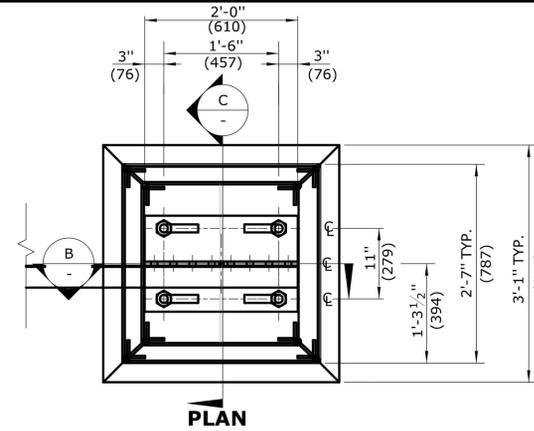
DETAILS OF ANCHORAGE IN ROCK CUT SLOPE
